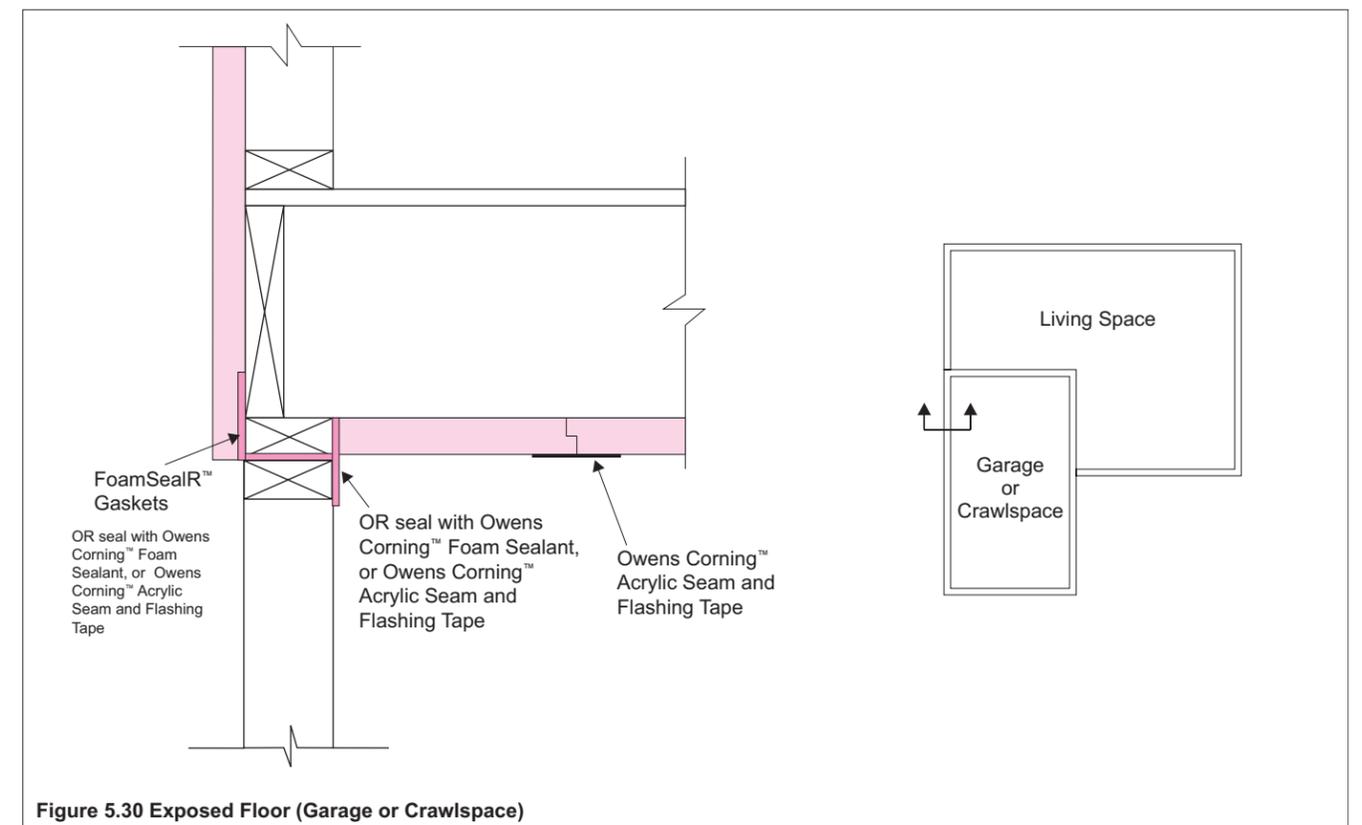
Exposed Floor (Garage or Crawlspace)
